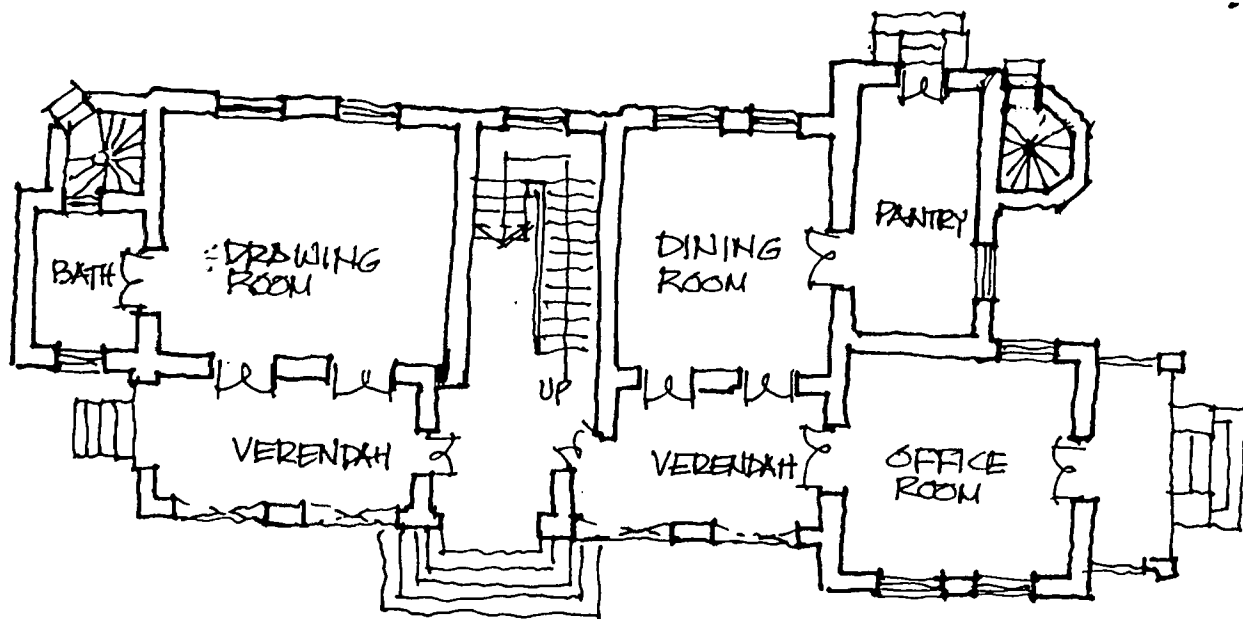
Ground floor plan, Civil surgeon bungalow, Khulna
